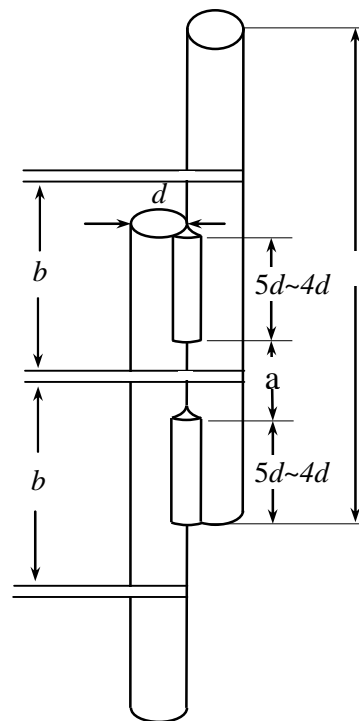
Schematic of welded lap joint of reinforcing steel specimens ^[5-7].
